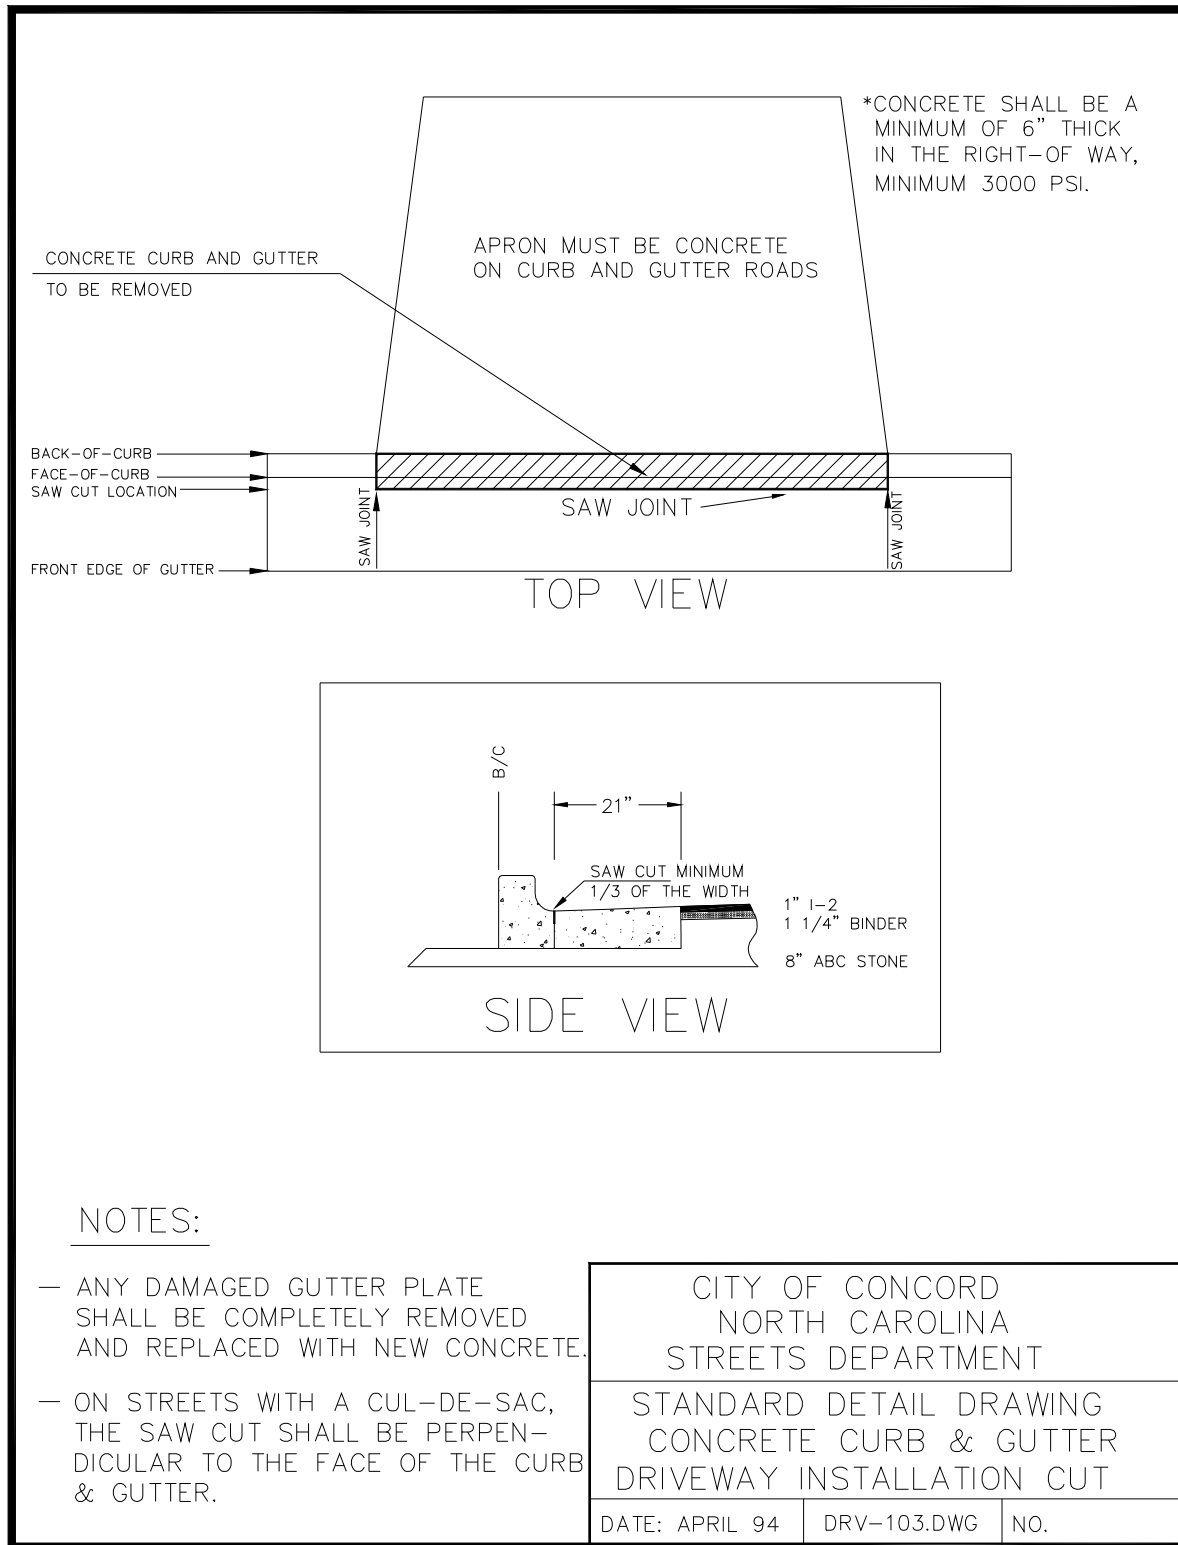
Concrete Curb and Gutter Driveway Cut.
